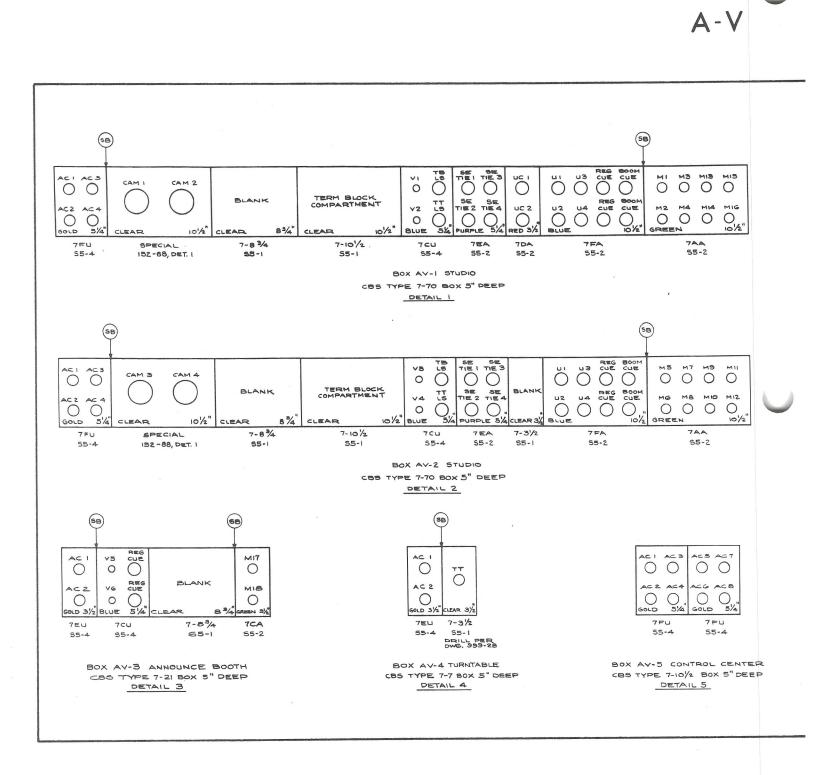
A typical electrical contractor AV outlet drawing.
